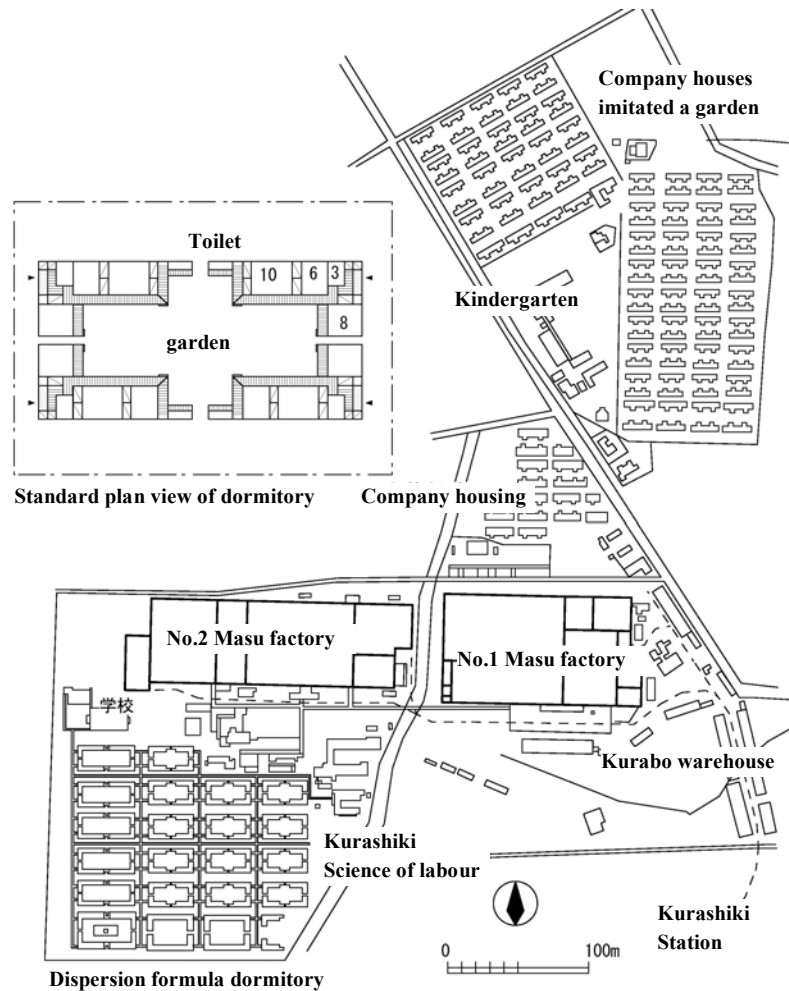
Layout drawing of Kurabo Masu factory (1928)
